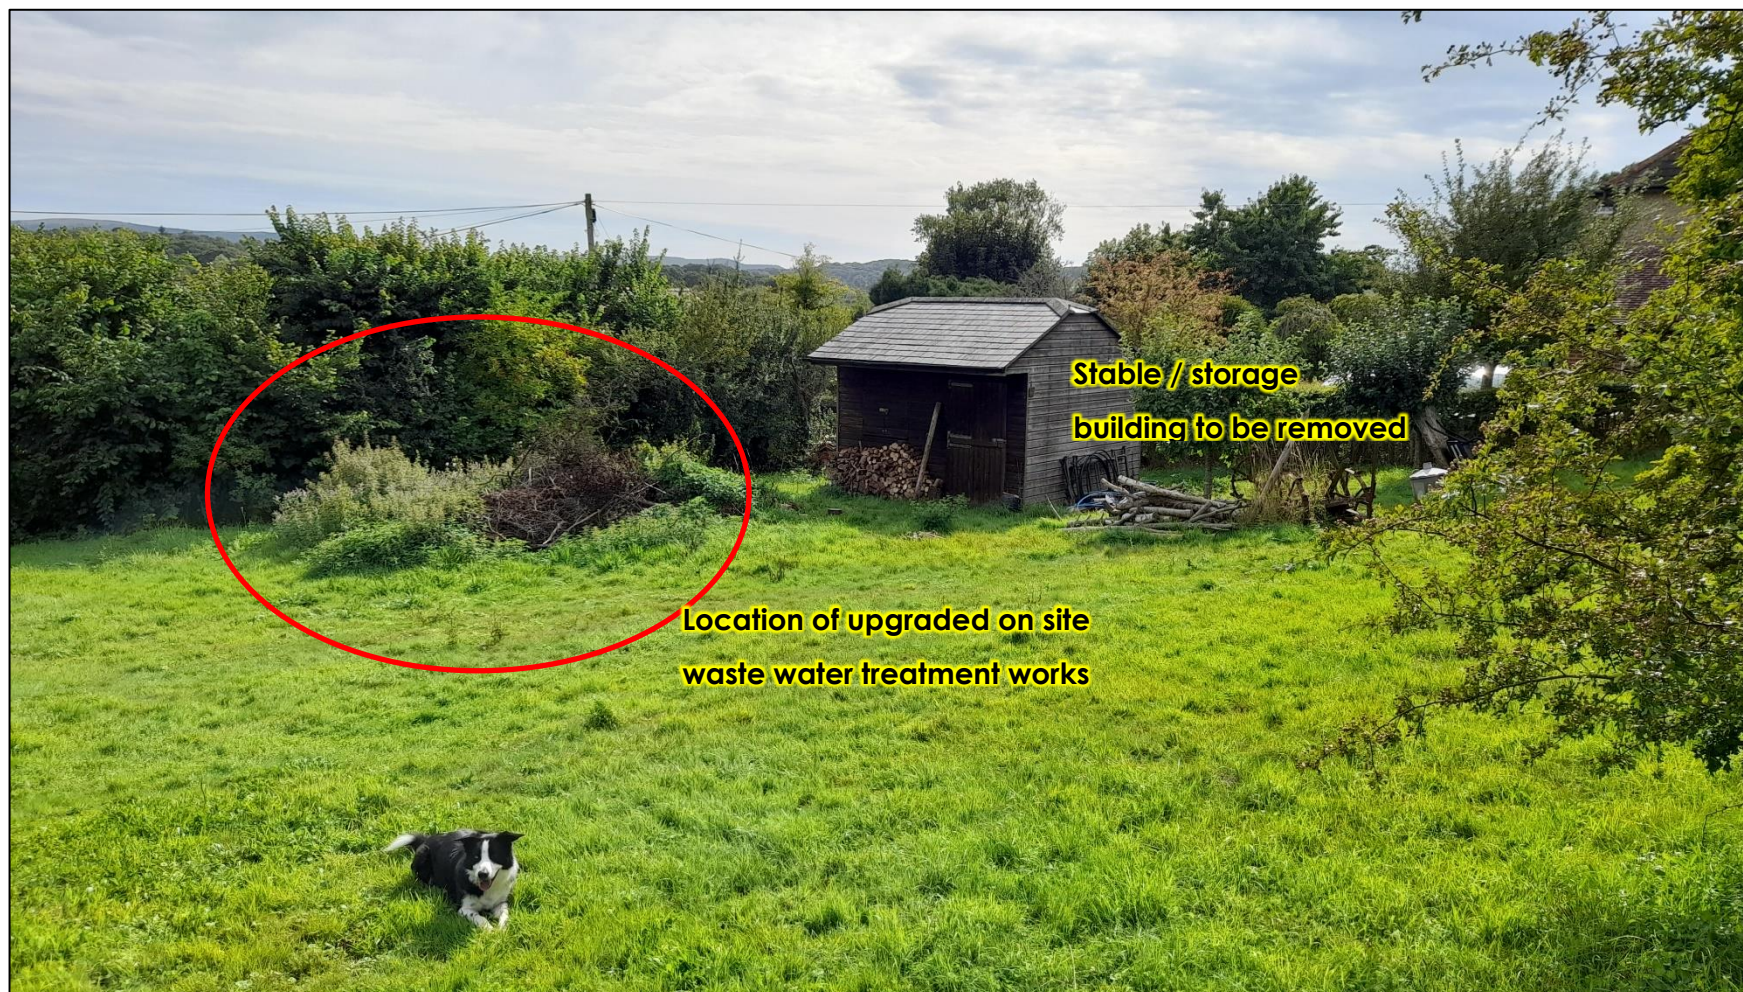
the proposed replacement waste water treatment plant will be approximately where the overgrowth is, to the left of the shed. Existing car parking is to the right.
